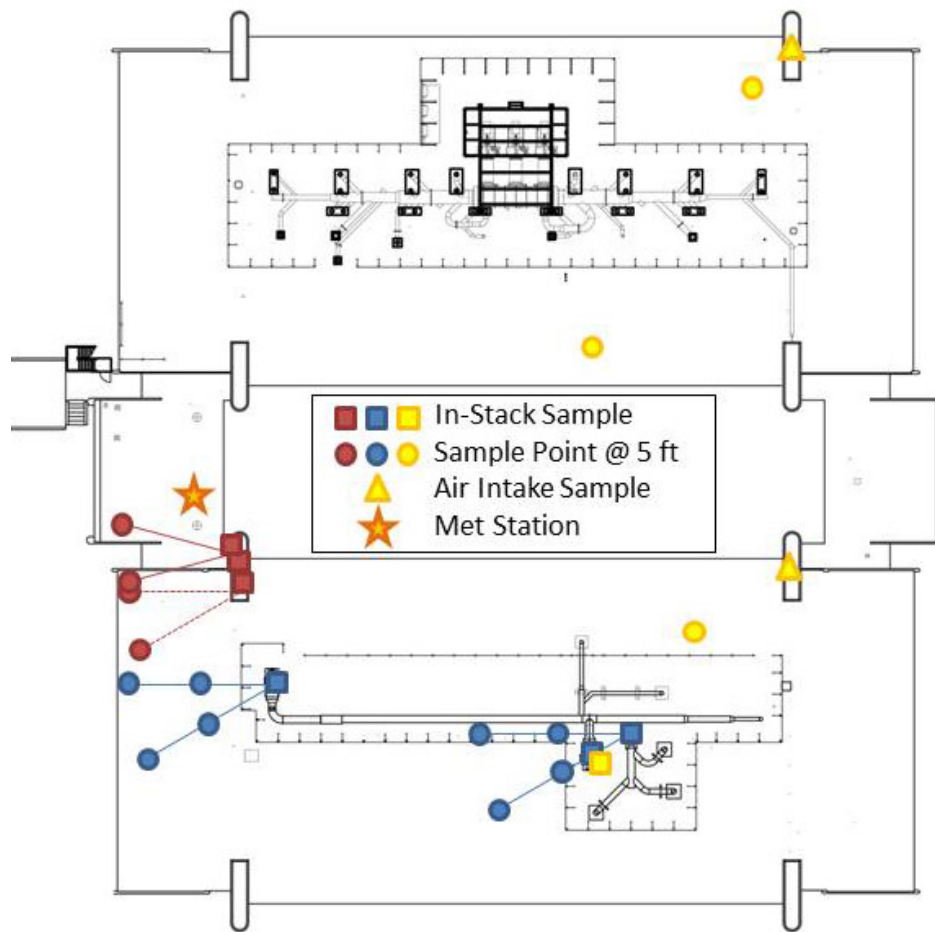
Plan View of the PSL Building Rooftop with Test Equipment Locations
